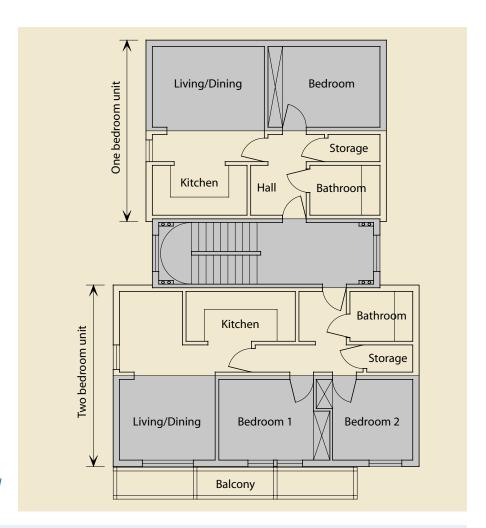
Plan form of modular residential building – alternate modules shown shaded
